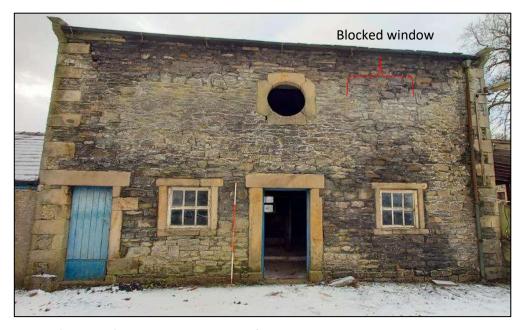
(shot 241): Northeast elevation of the byre, looking southwest, 2m scale
